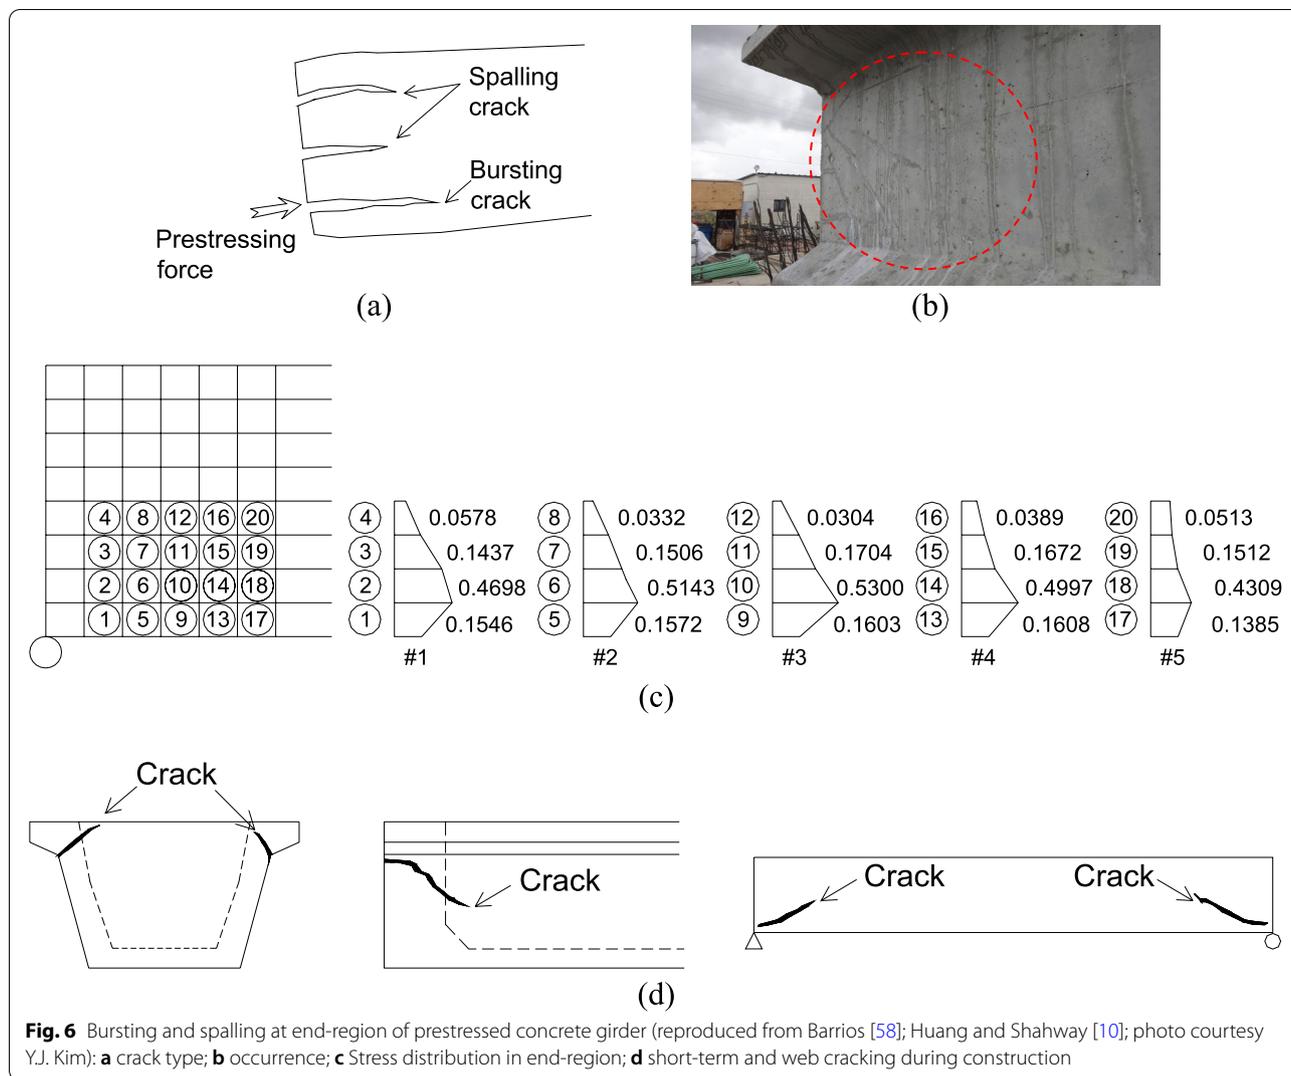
Bursting and spalling at end-region of prestressed concrete girder (reproduced from Barrios [58]; Huang and Shahway [10]; photo courtesy Y.J. Kim): a crack type; b occurrence; c Stress distribution in end-region; d short-term and web cracking during construction
